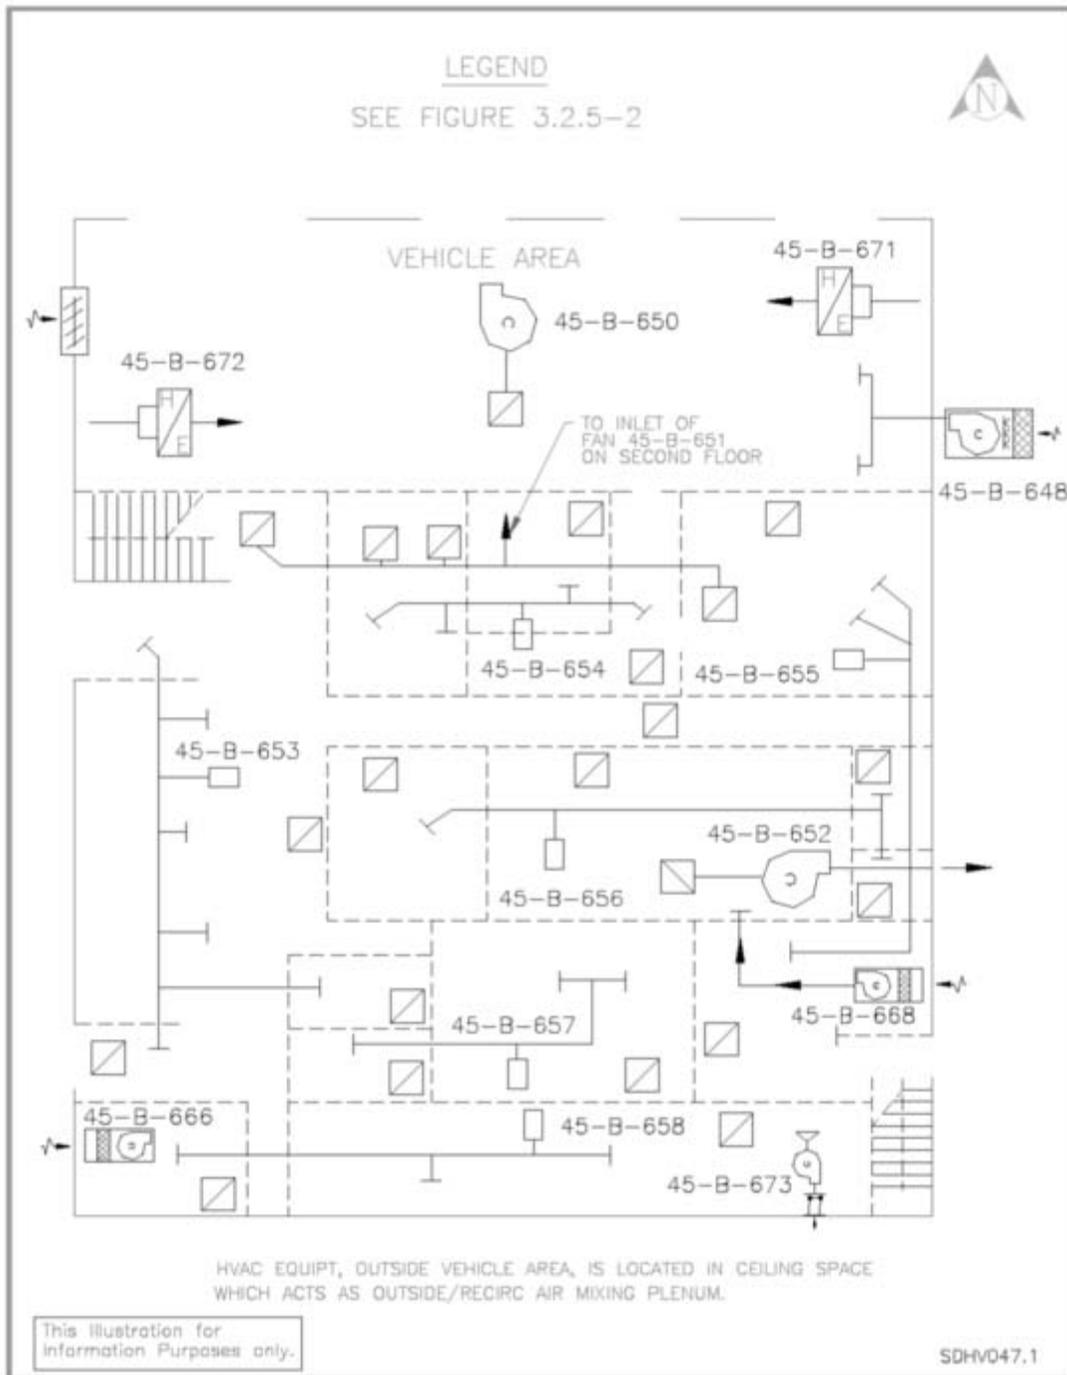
HV05 S&E Building Ground Floor HVAC Block Diagram
